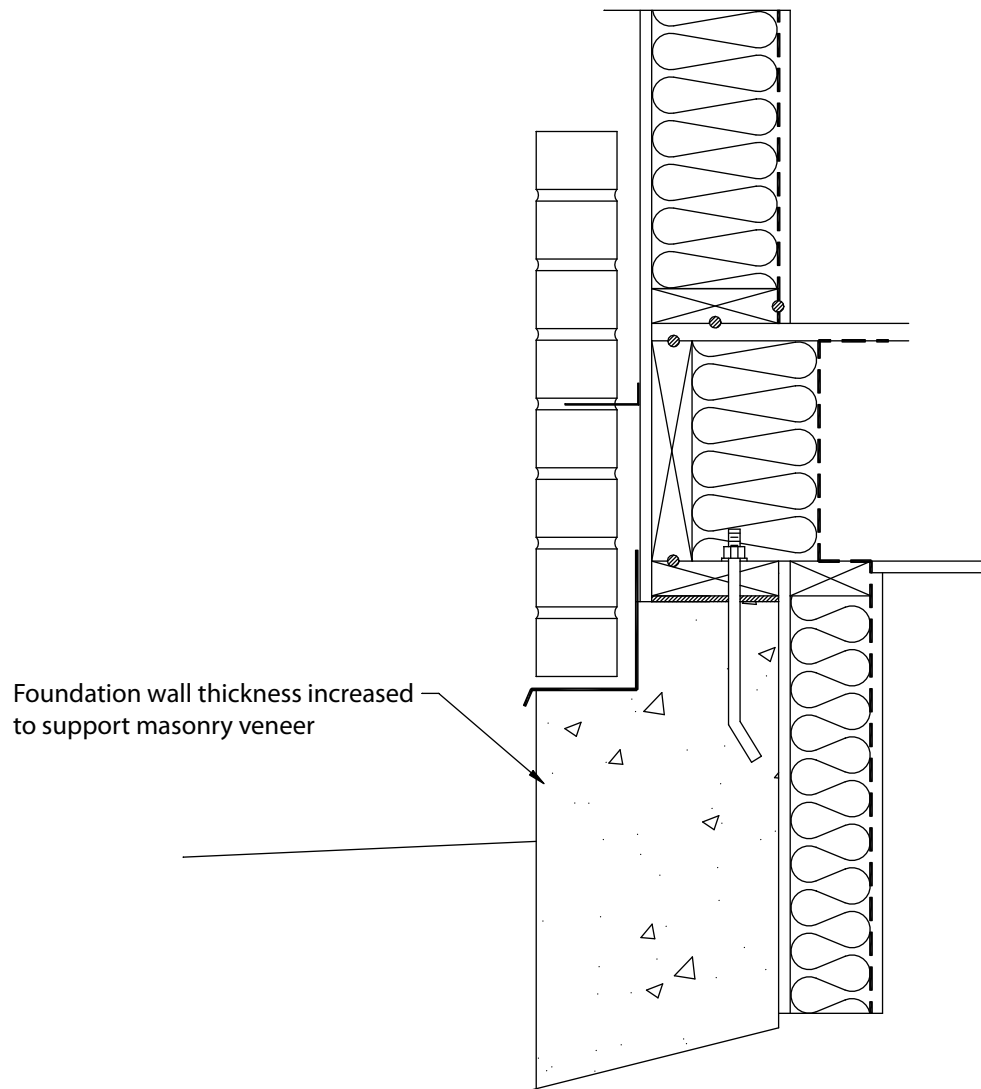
Masonry veneer supported on a ledge in the foundation wall
